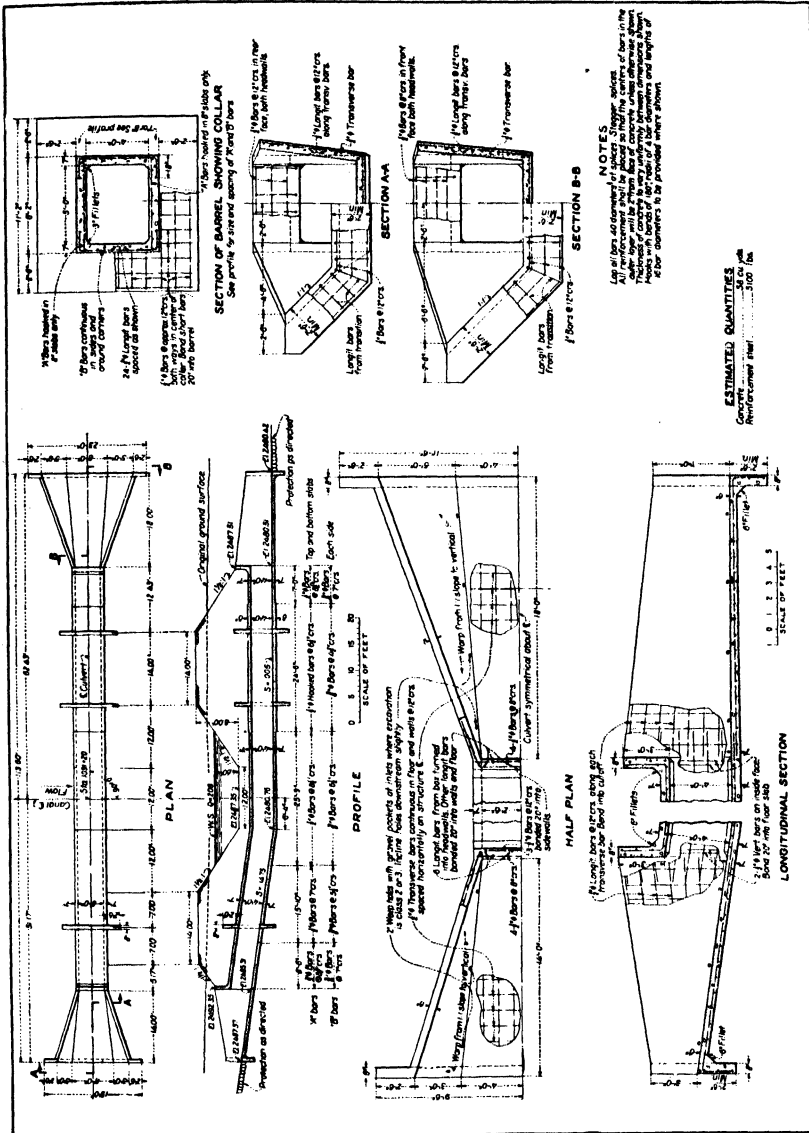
Box culvert on South Canal, Succor Creek division, Owyhee project, Idaho.
